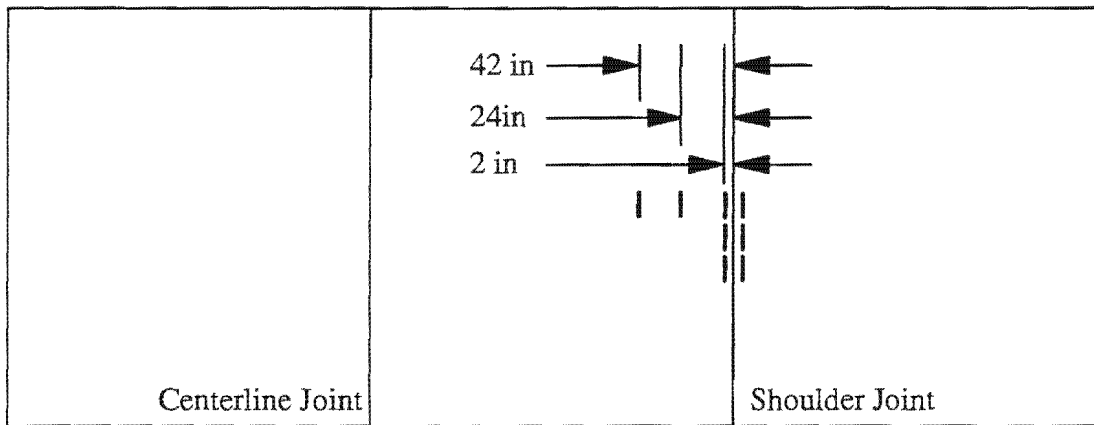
Instrumentation layout for the tied 12-ft lane section.
